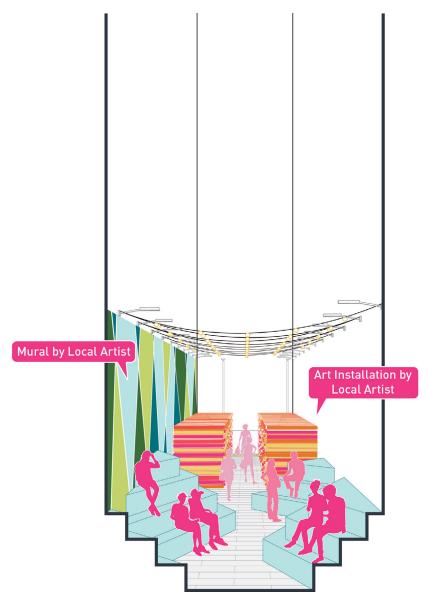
Laneway 6 Design; Section 6a, perspective section
